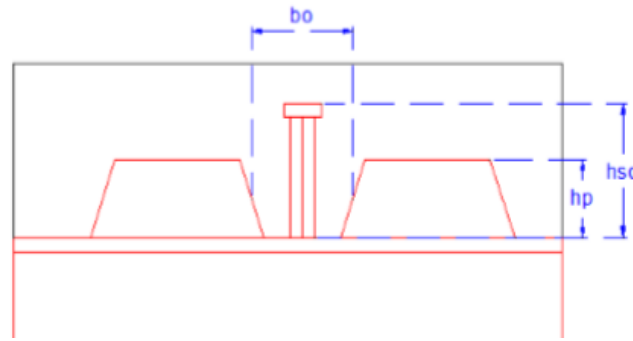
8 Composite beam with metal profile decking transverse to steel beam [14]
